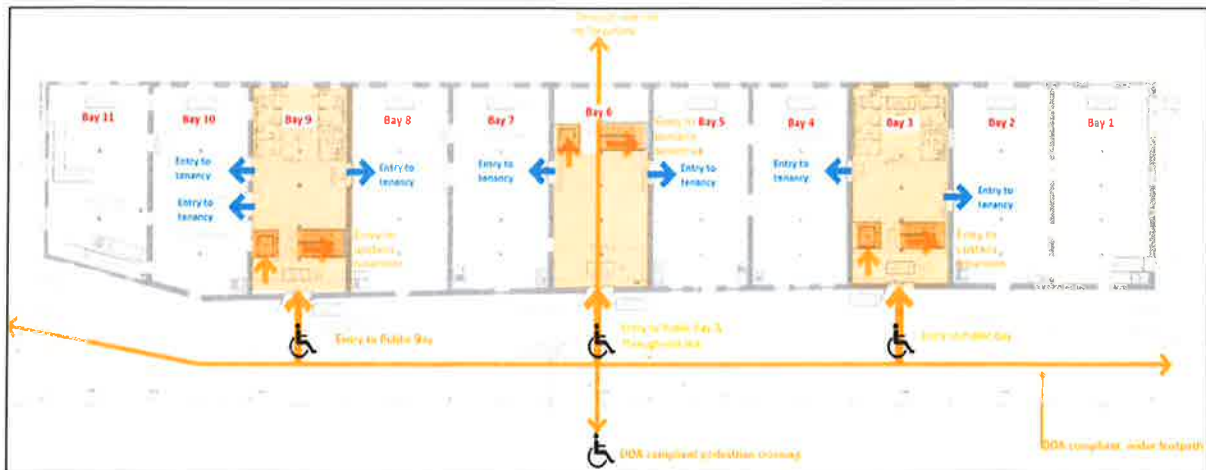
The proposed layout of the Campbell's Stores comprising three public centralised Bays. (Source: Applicant's EIS).
